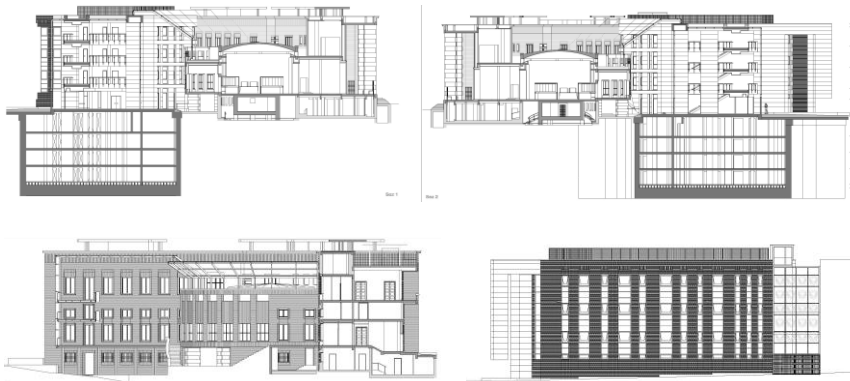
Sections and elevations of adaptive re-use project of Bank of Albania building. Source: Petreschi, 2010.
